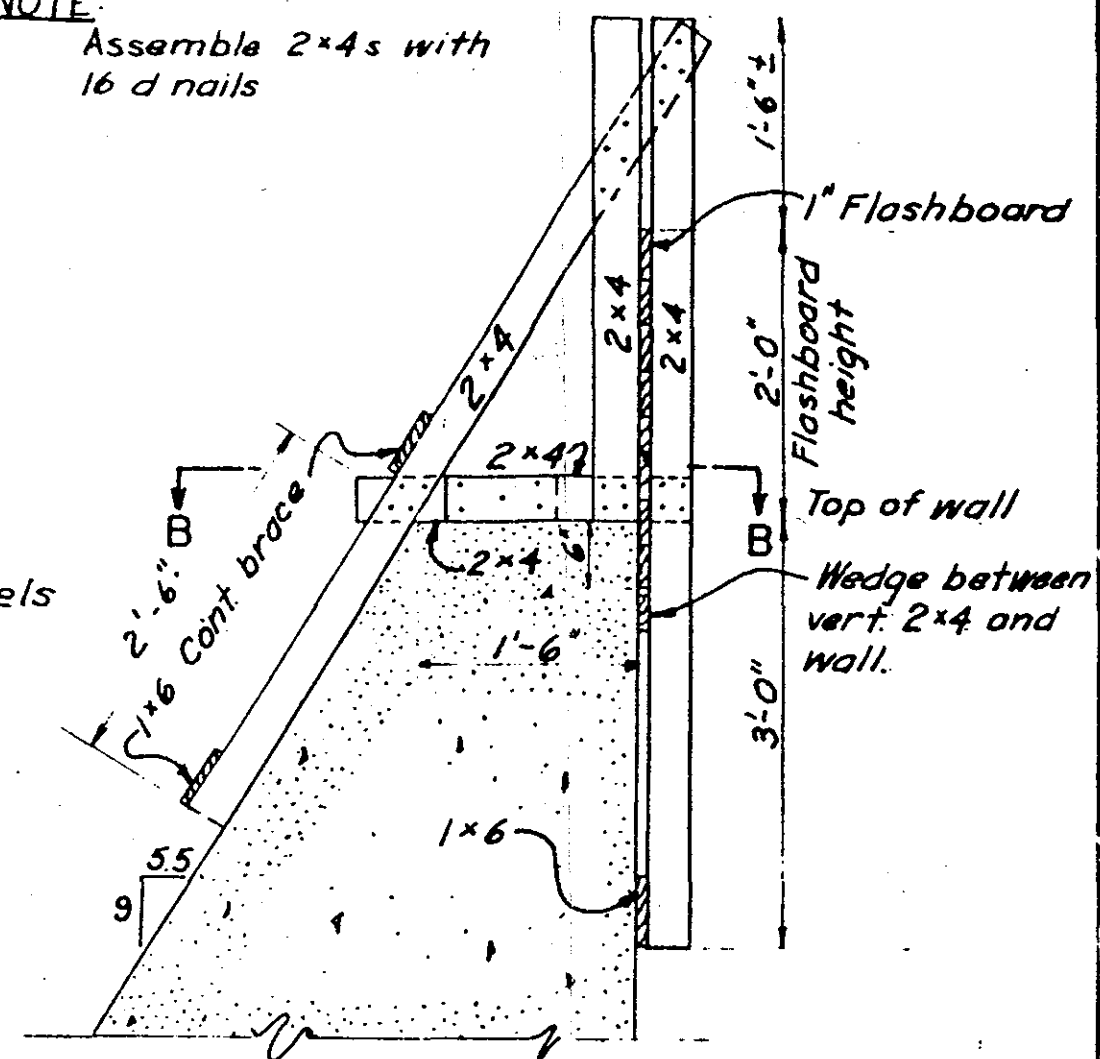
## DETAIL ELEVATION OF FLASHBOARD FRAMES
